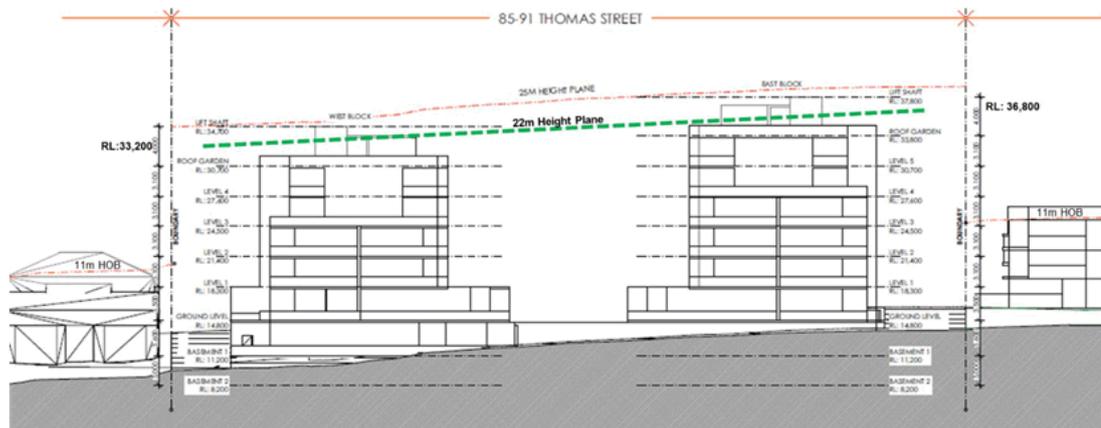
Section facing north from Parramatta River with adjacent properties (Source: PTI Architecture)
